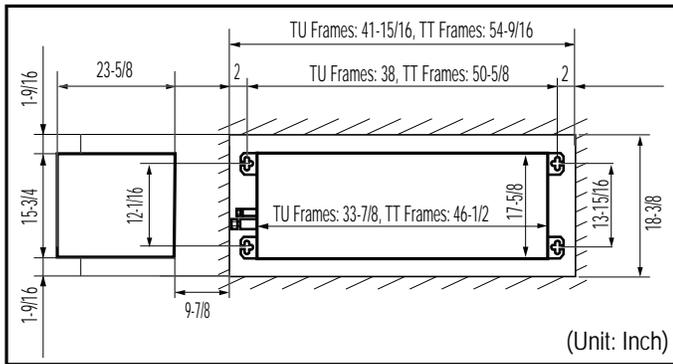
Ceiling Opening / Hanging Bolt Locations for Two-Way Ceiling Cassette Indoor Units.
